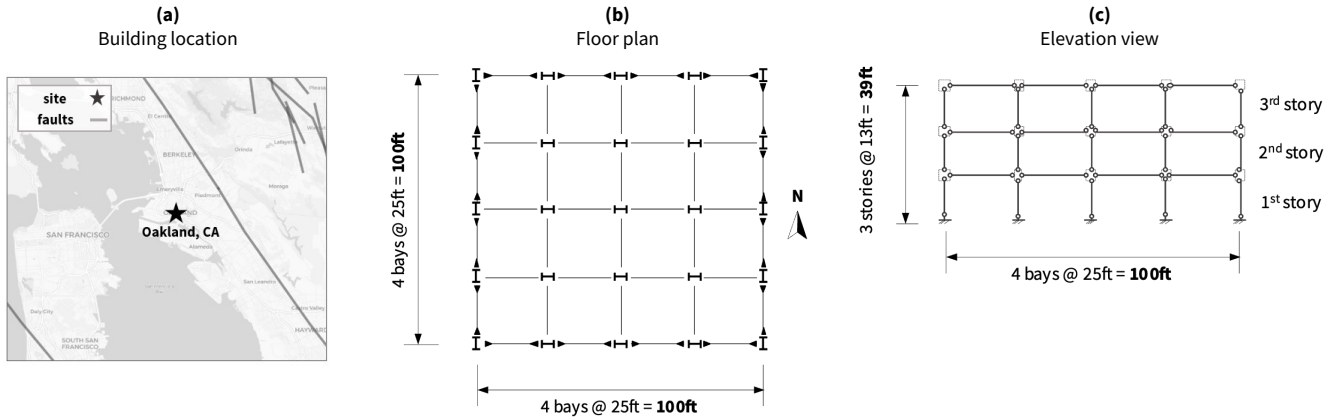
The location, floor plan, and elevation view of the three story office building used in the case study.
